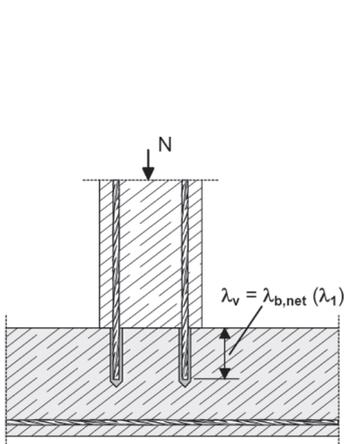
Rebar connections for items primarily subjected to compression. The rebars are subjected to compression.
